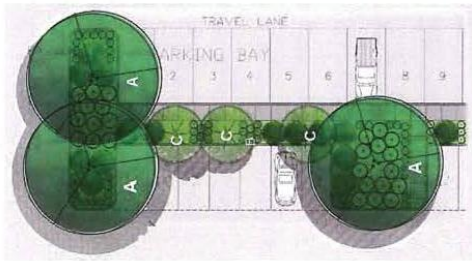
Example of Parking Lot Planter Areas.
